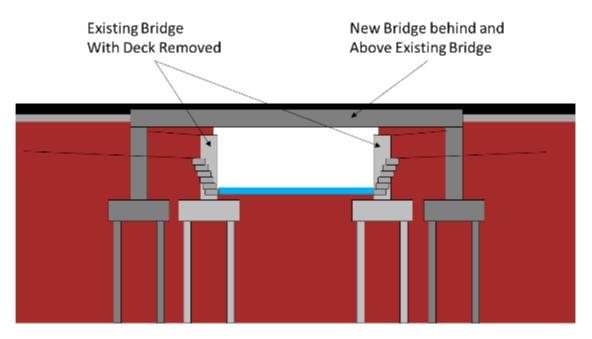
Illustration of assumed new A23 Brighton Road Bridge
